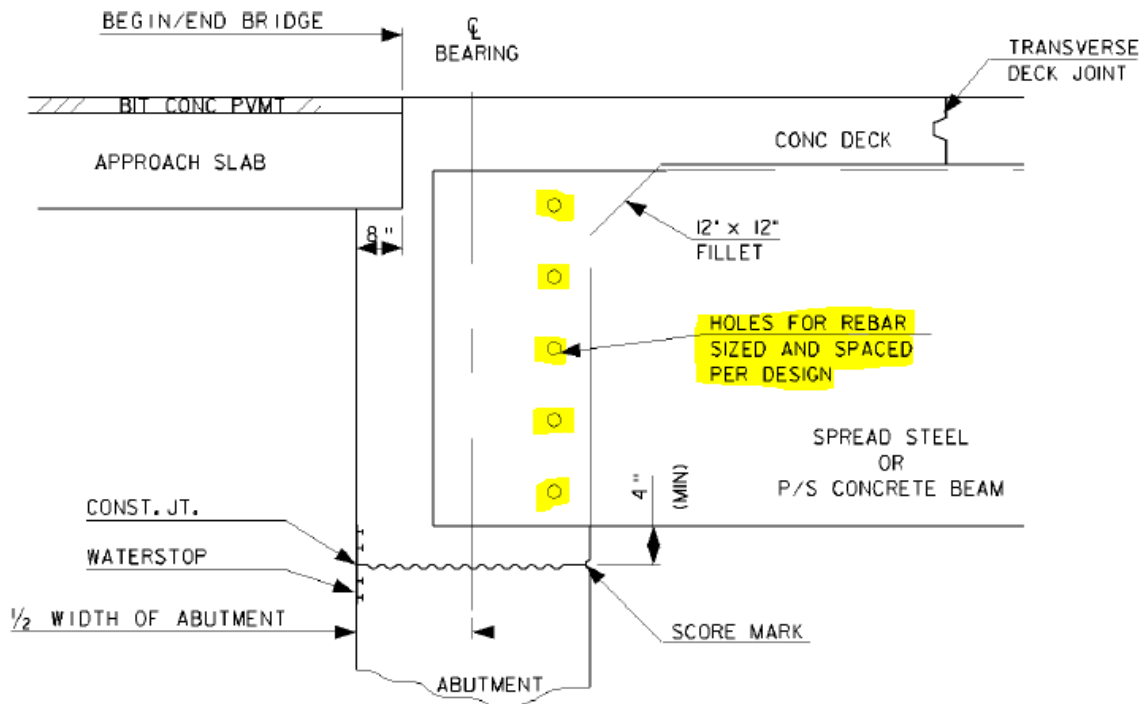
1 Type A – Bridge Ends for Integral Abutment Bridges with Approach Slabs.
